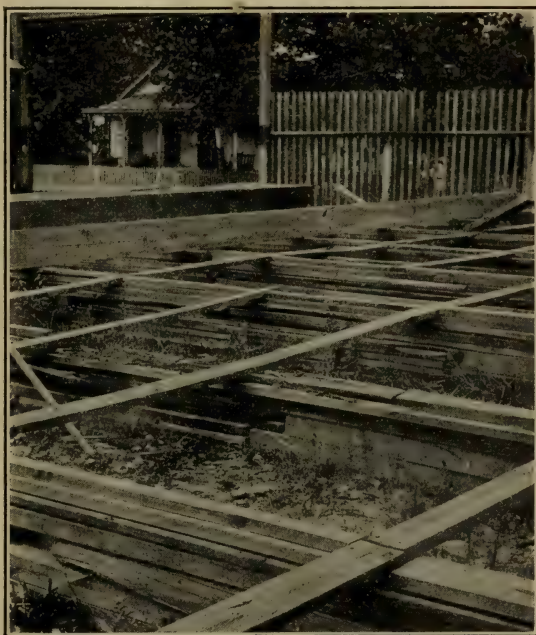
Built-up pine foundations in a retail yard in Tennessee. Many of the foundation timbers are seriously decayed and infection may pass to timbers piled in contact with them. Figure 17 shows what happened to a structural timber placed on a foundation in this yard similar to these.
